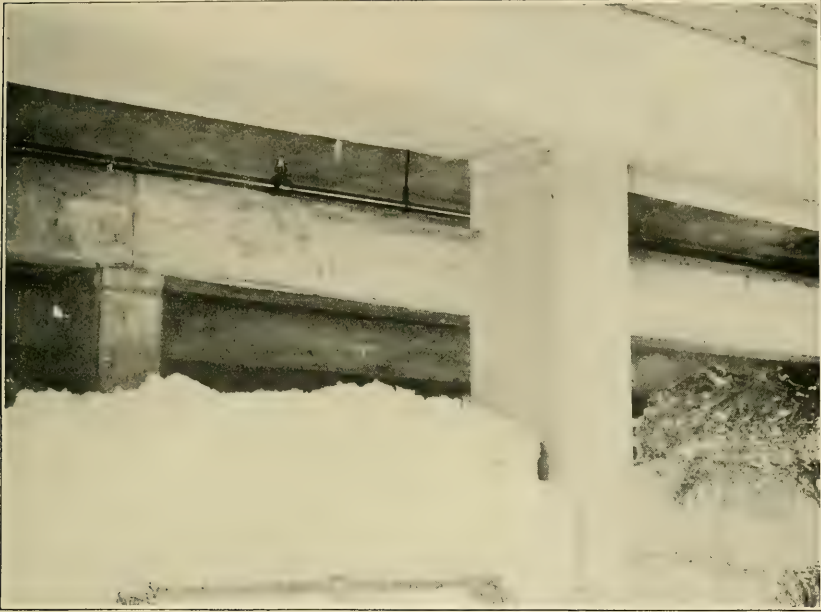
CEILING SHOWING A REINFORCED CONCRETE FLOOR ABOVE.
